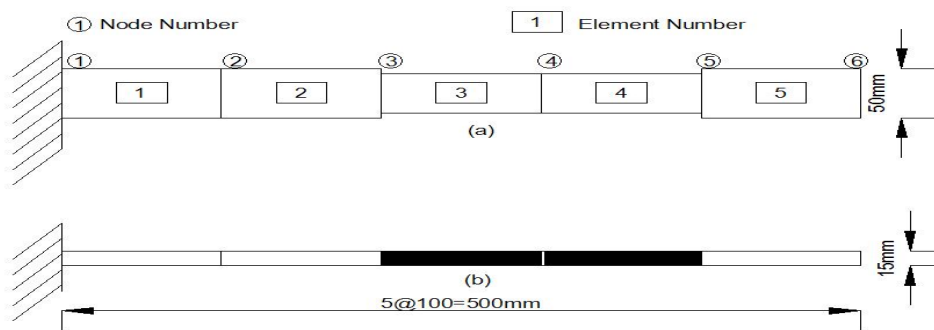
(a) Plan; and (b) Elevation of damaged (Multiple elements) steel cantilever beam
